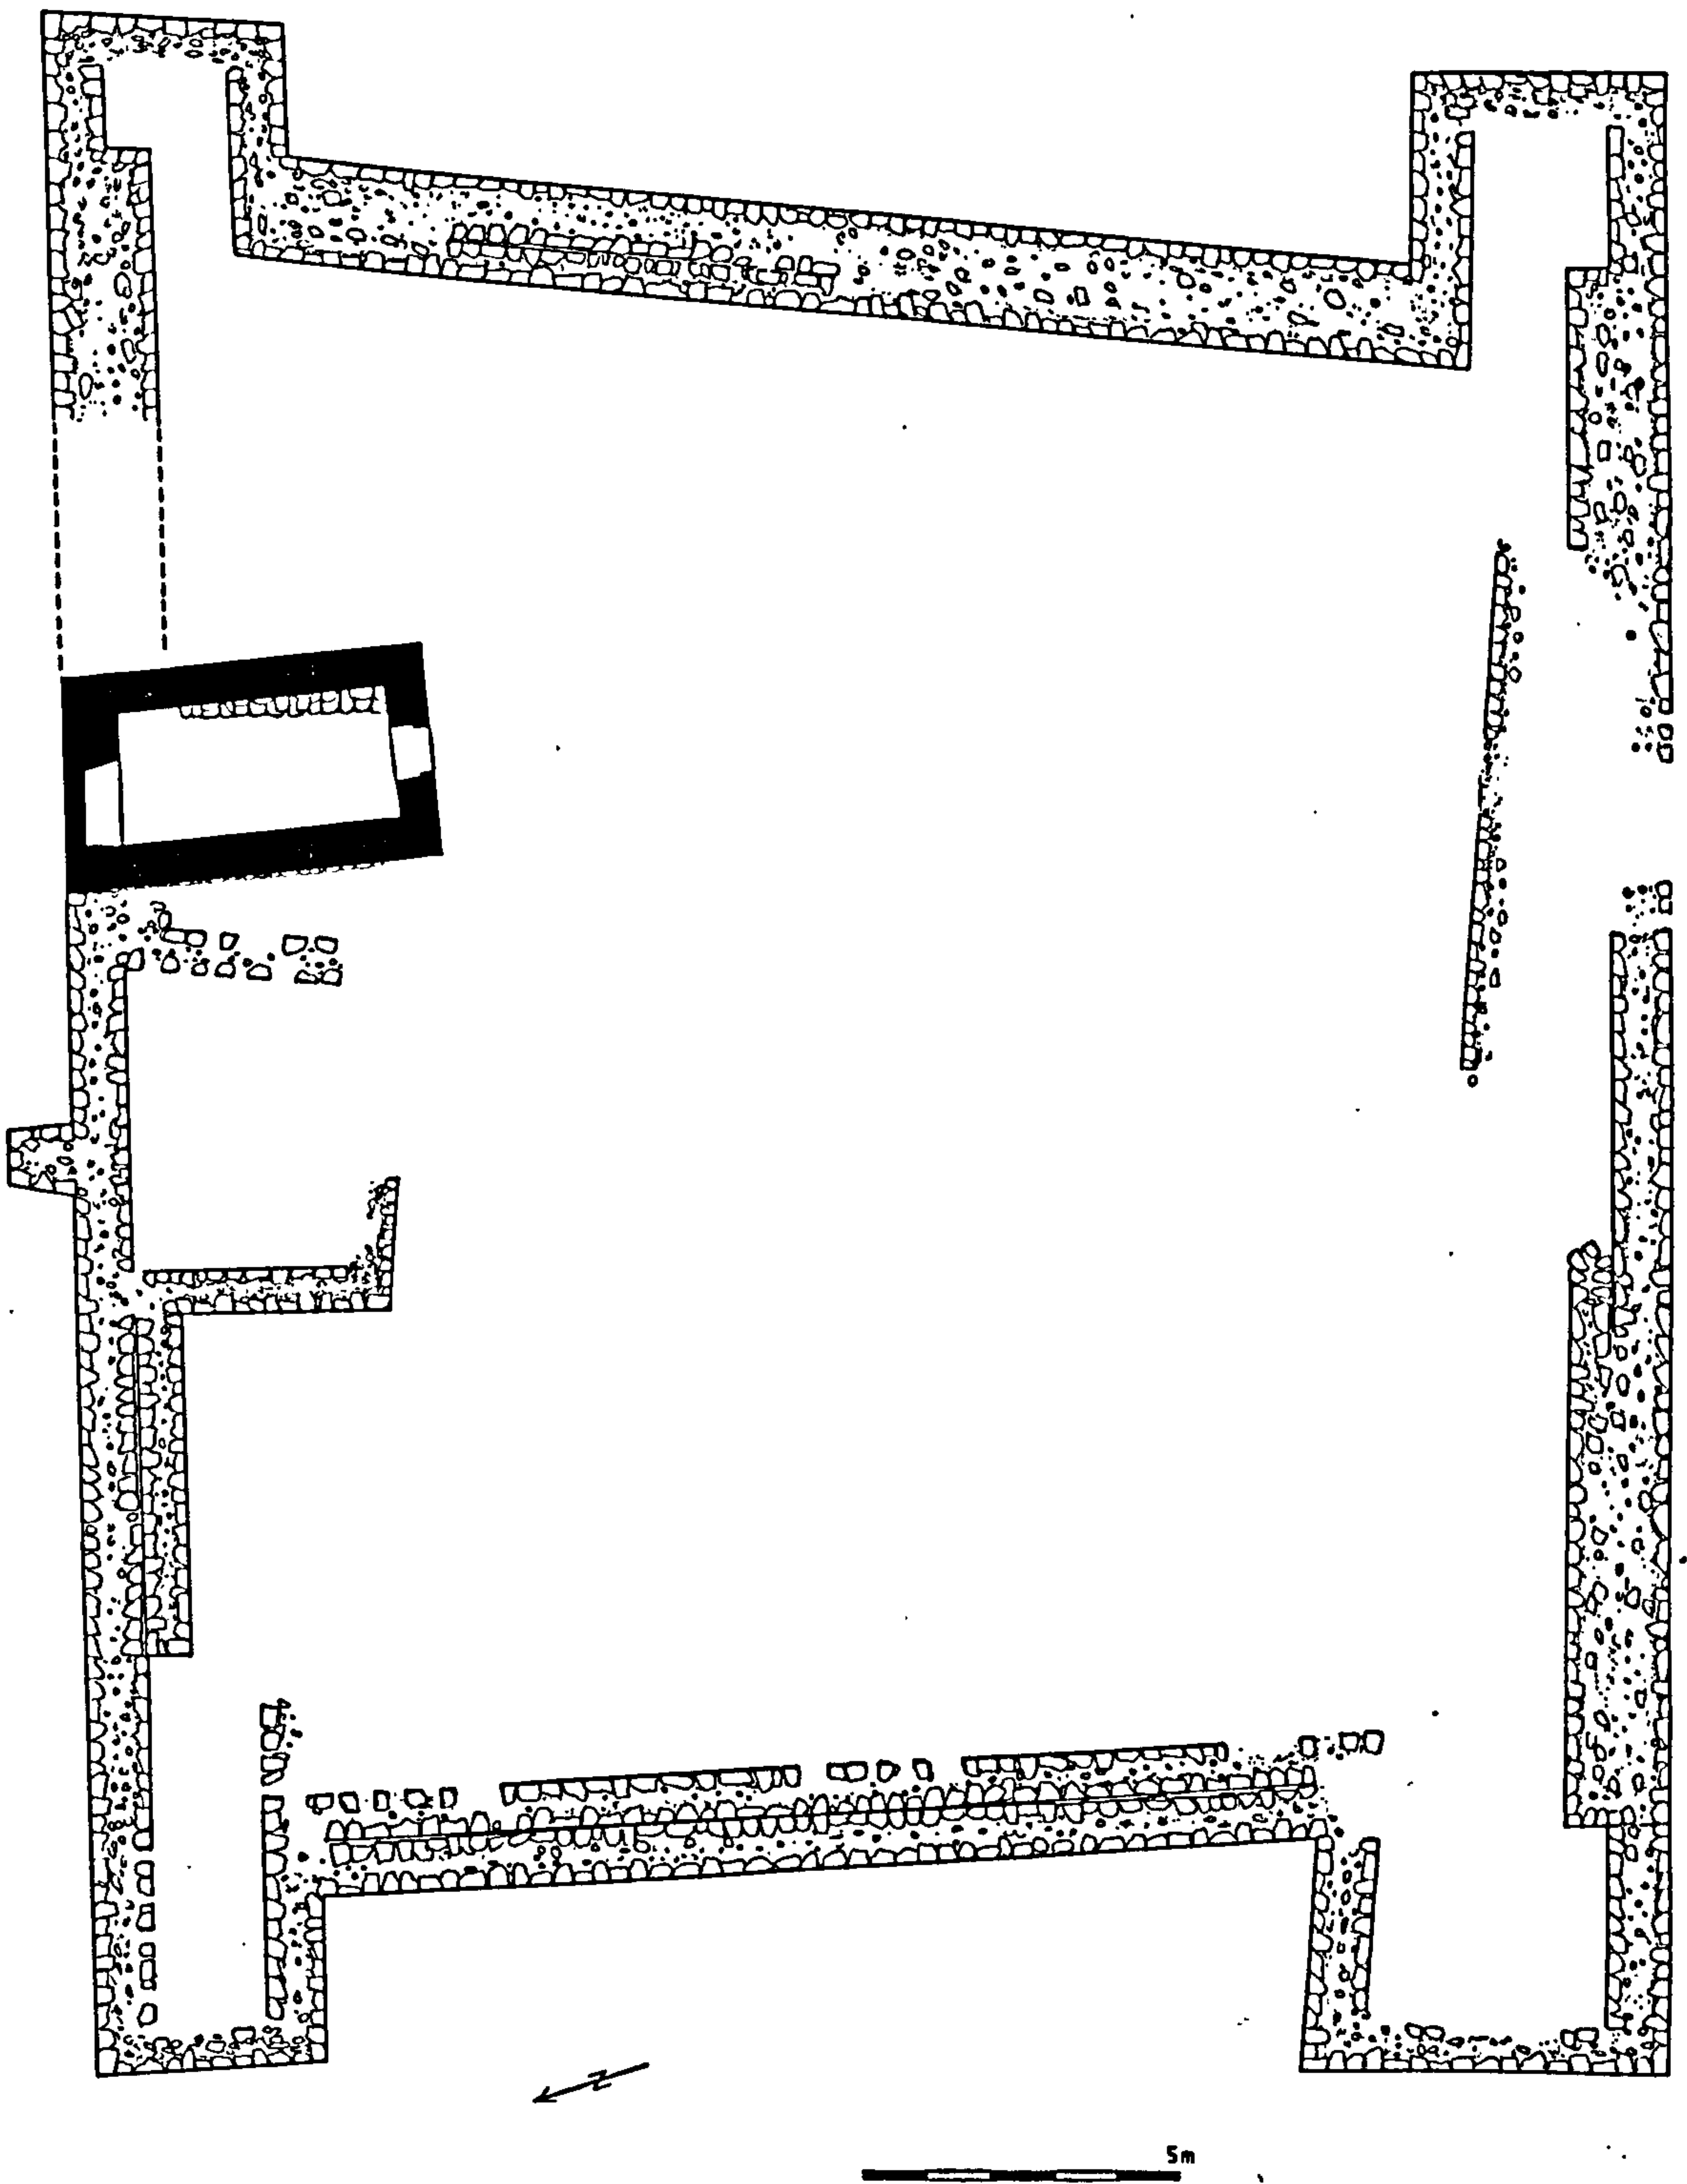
STAUROS ground plan of TETRAPHYRGIO
